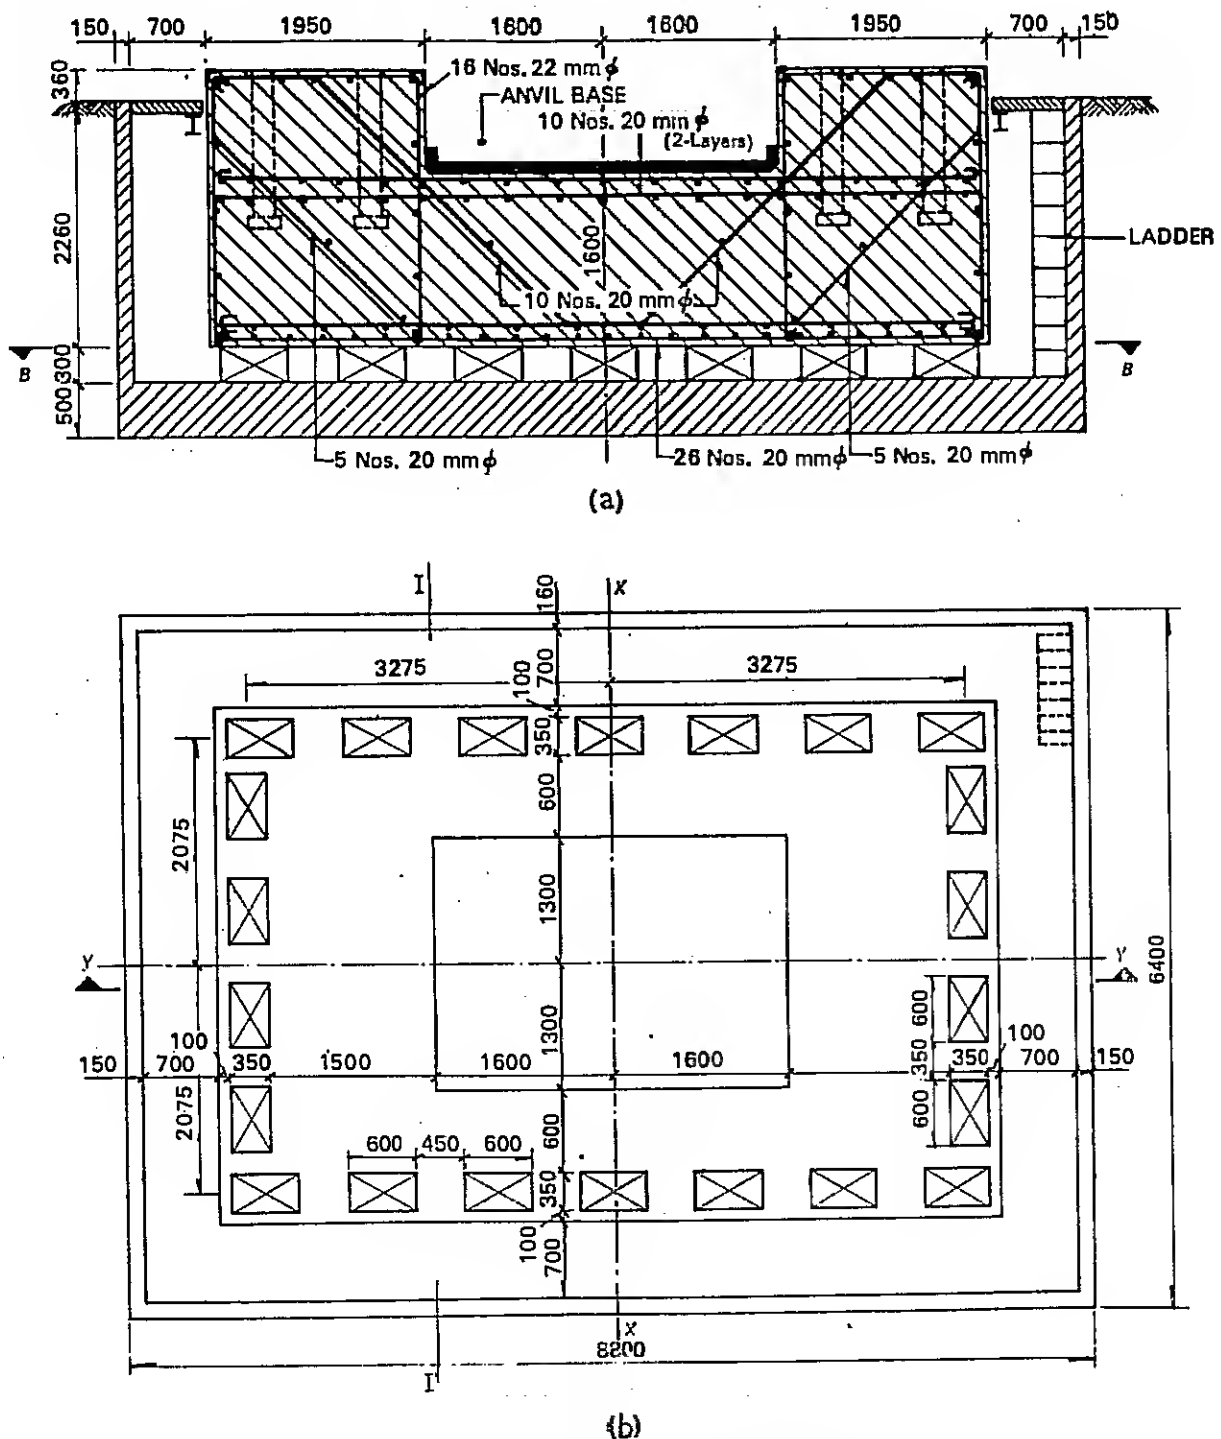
Foundation for a 3.4 t Hammer on Springs—(a) Section y-y, (b) Plan at B-B.
